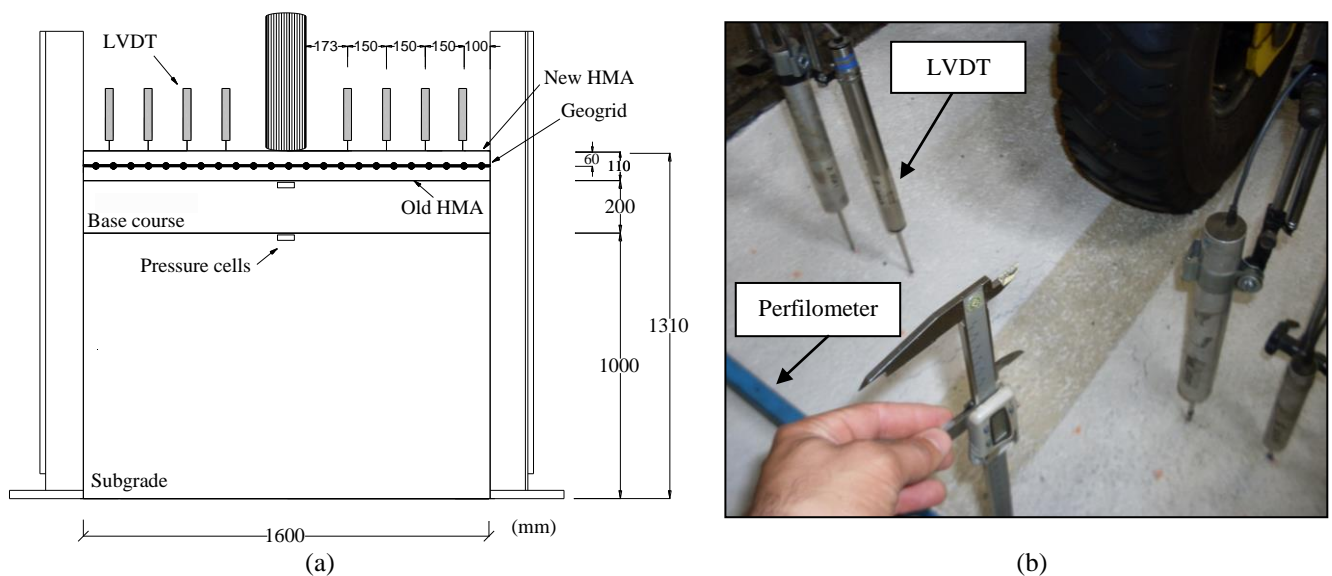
Instrumentation: (a) pavement sections layout and sensor location; (b) rutting measurement procedure.
